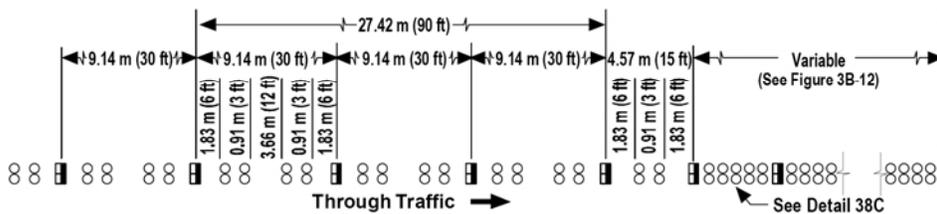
B - Lane Drop Markings at Conventional Highway Intersections
